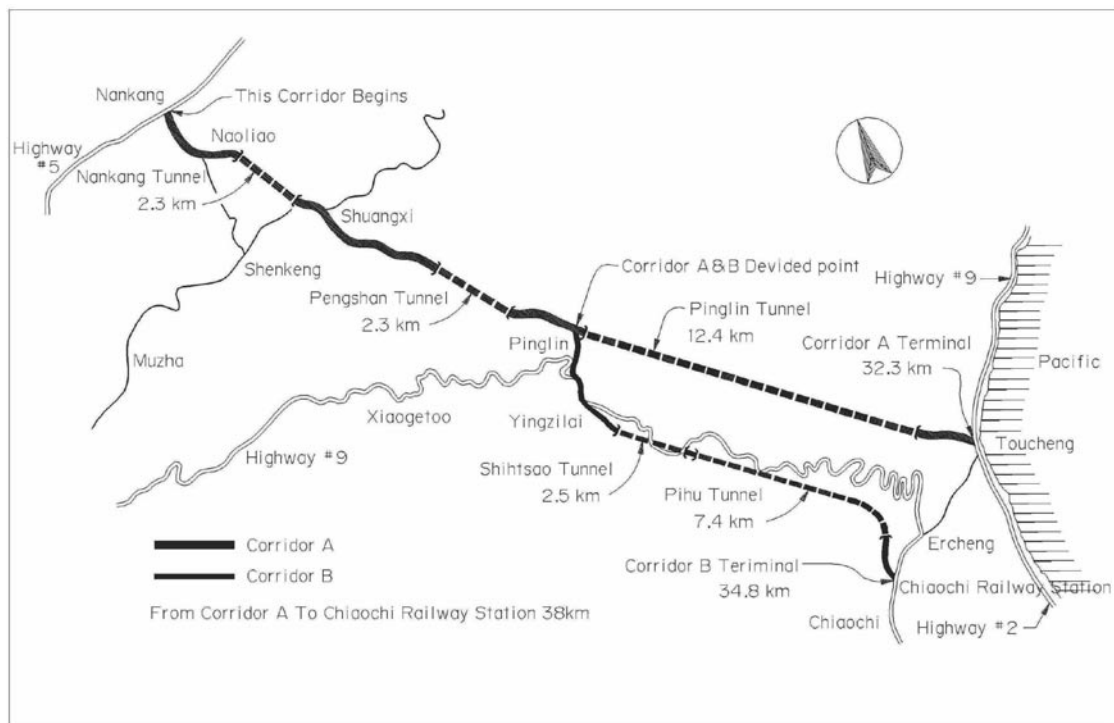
Sketch map of the Nankang Ilan Highway Tunnel
